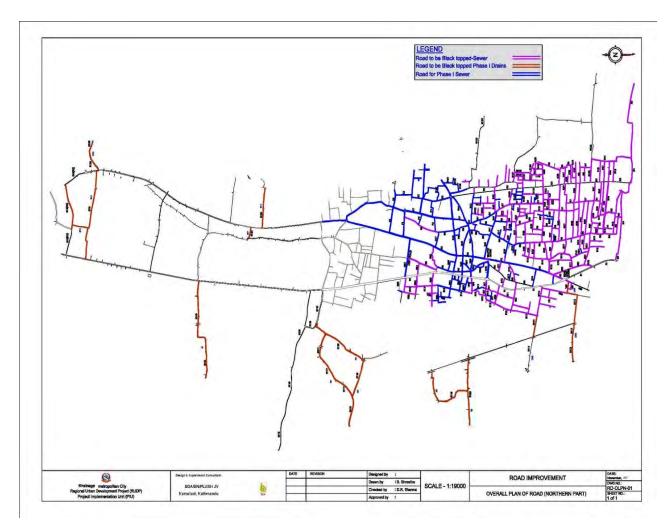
Overall Layout Plan of Road Improvement Networks (Northern part/main road)
